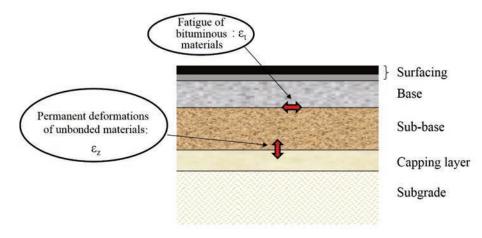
the two modes of damage considered for flexible airfield pavement structures
